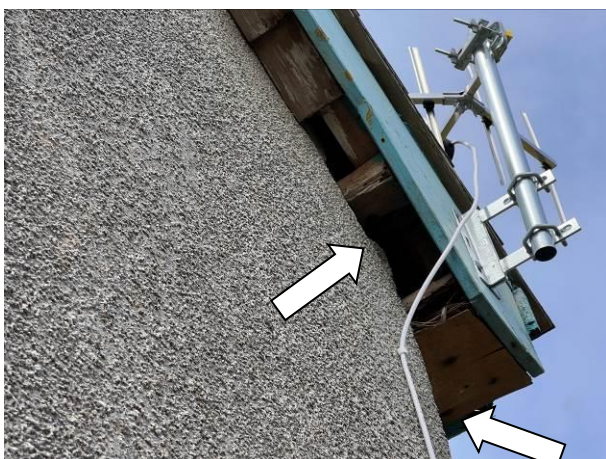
Showing the cedar shingles lining the overhang on the gables – an example of the potential access points between the wall and the shingle is indicated.
